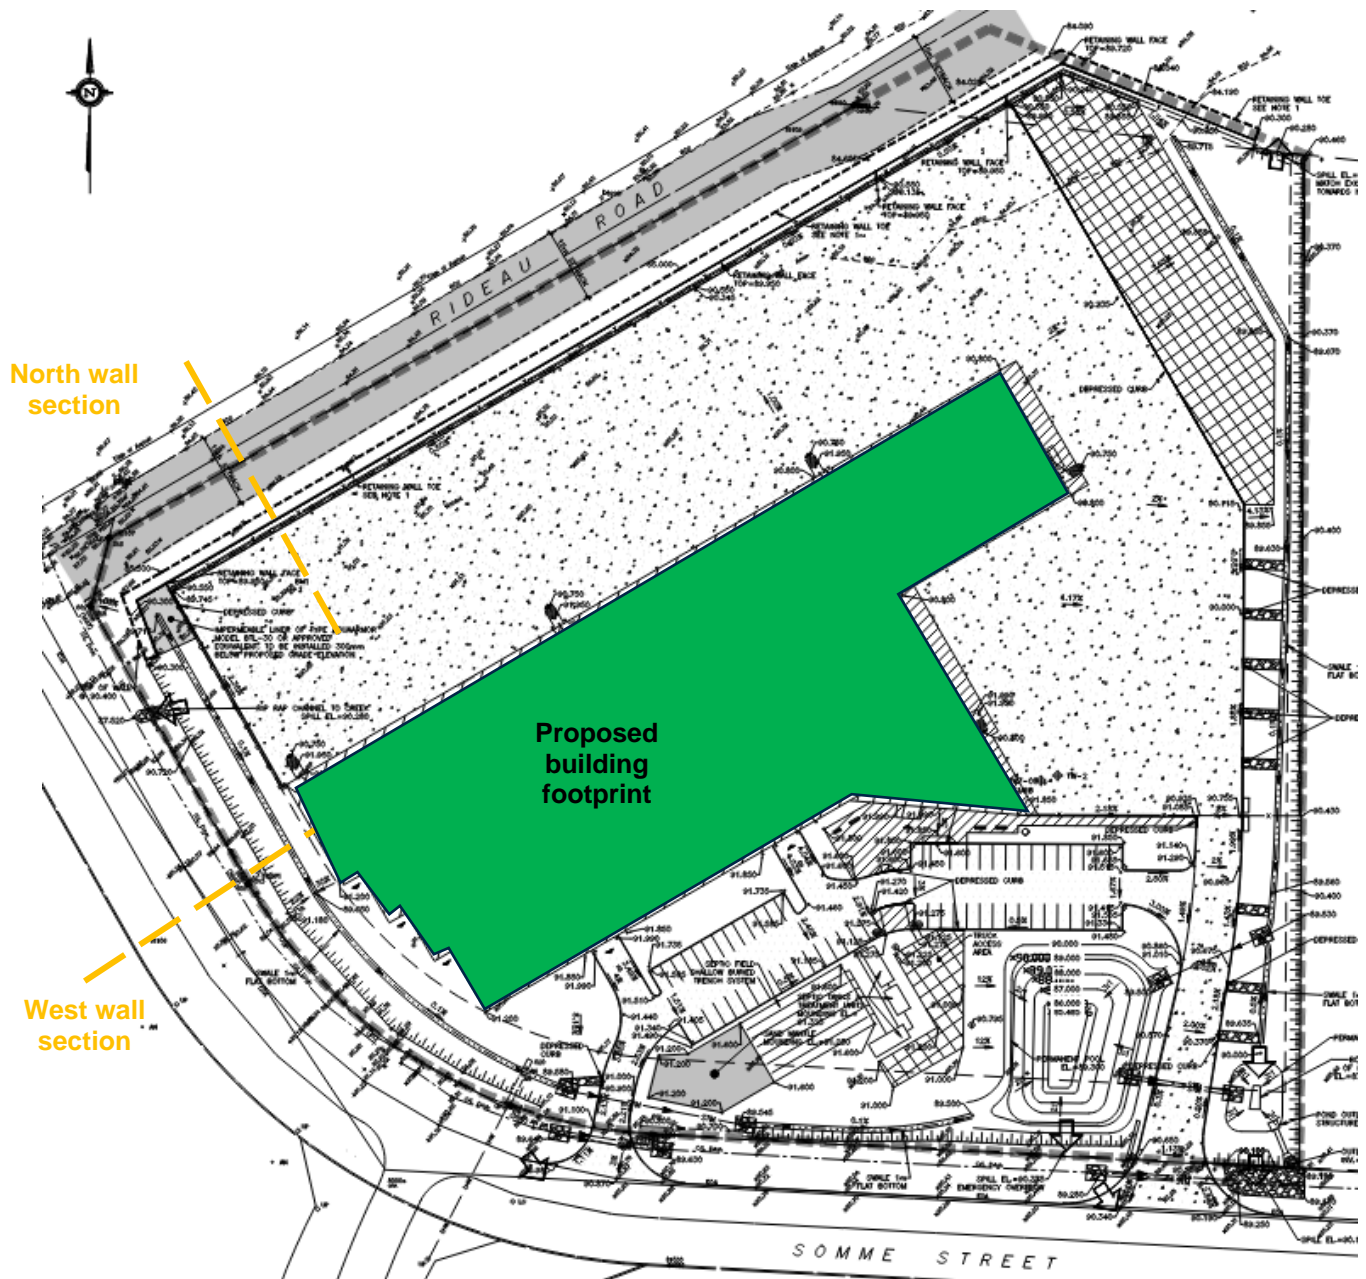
Site layout showing the location of the analysed cross sections and the proposed building footprint
